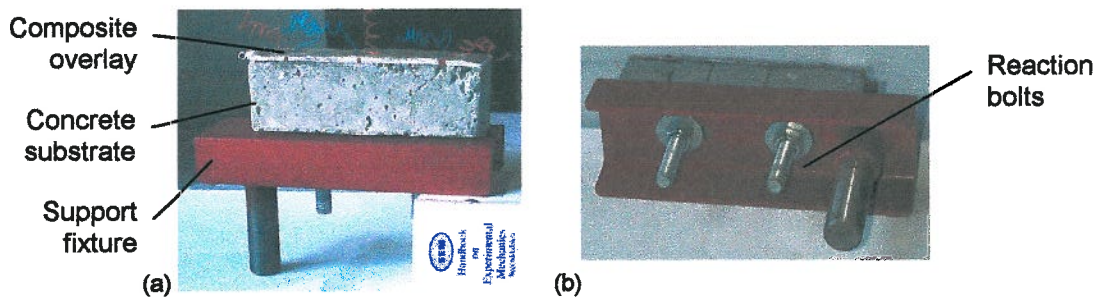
Test specimen developed at USC for testing adhesion strength and fracture toughness between composite overlay and structural substrate: (a) side view showing support fixture, concrete brick and composite overlay; (b) bottom view showing retention bolts (Giurgiutiu, Lyons, and Petrou, 1998).
